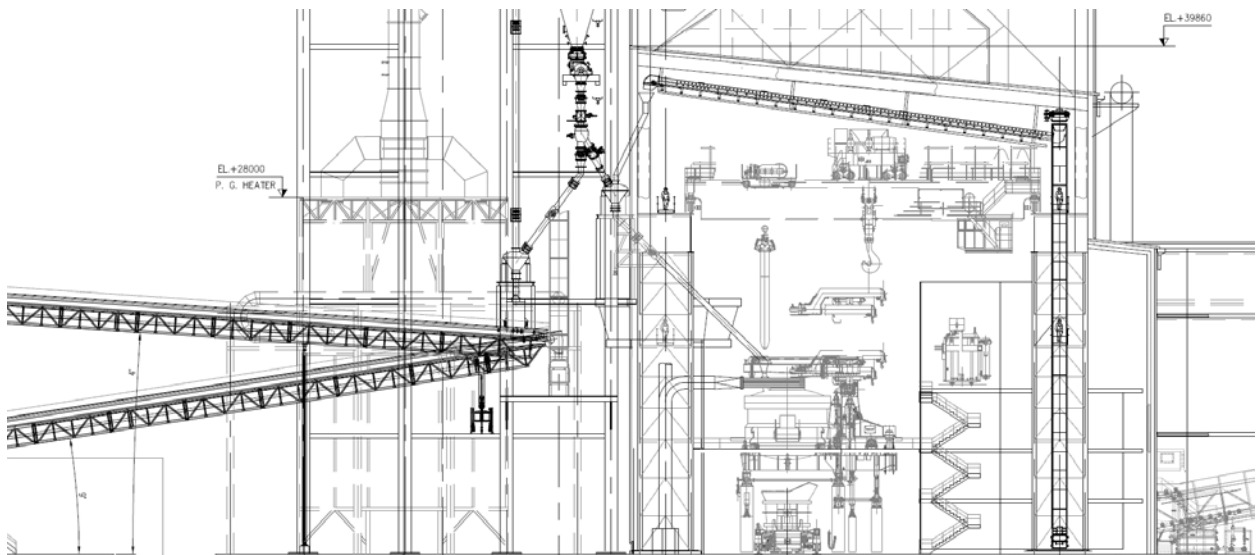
Cross section of the plant showing the hot discharge chute from DRI module to EAF
